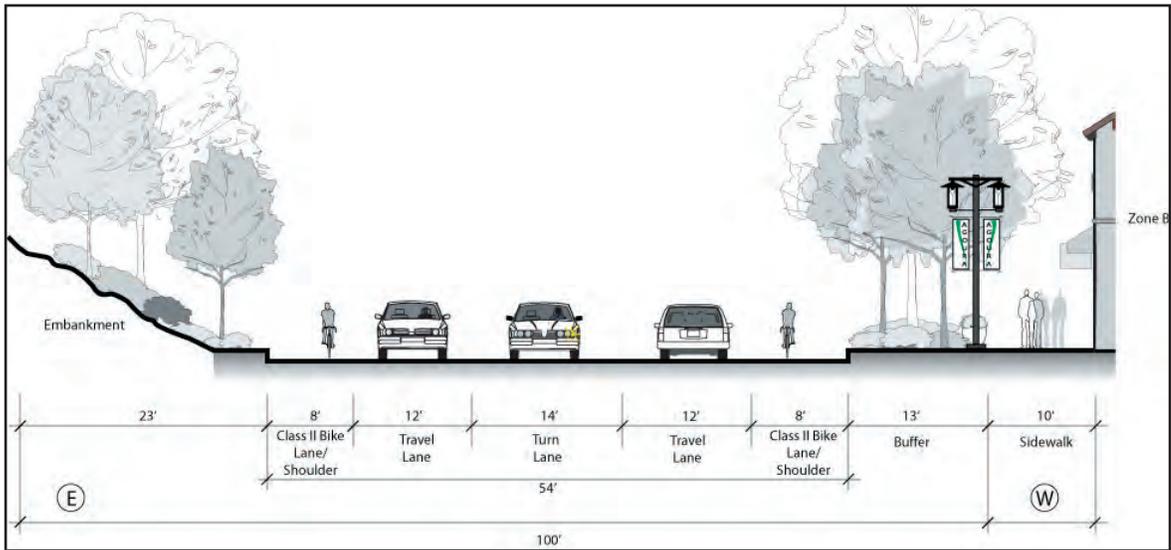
Future Kanan Road street section (south of Agoura Road)
